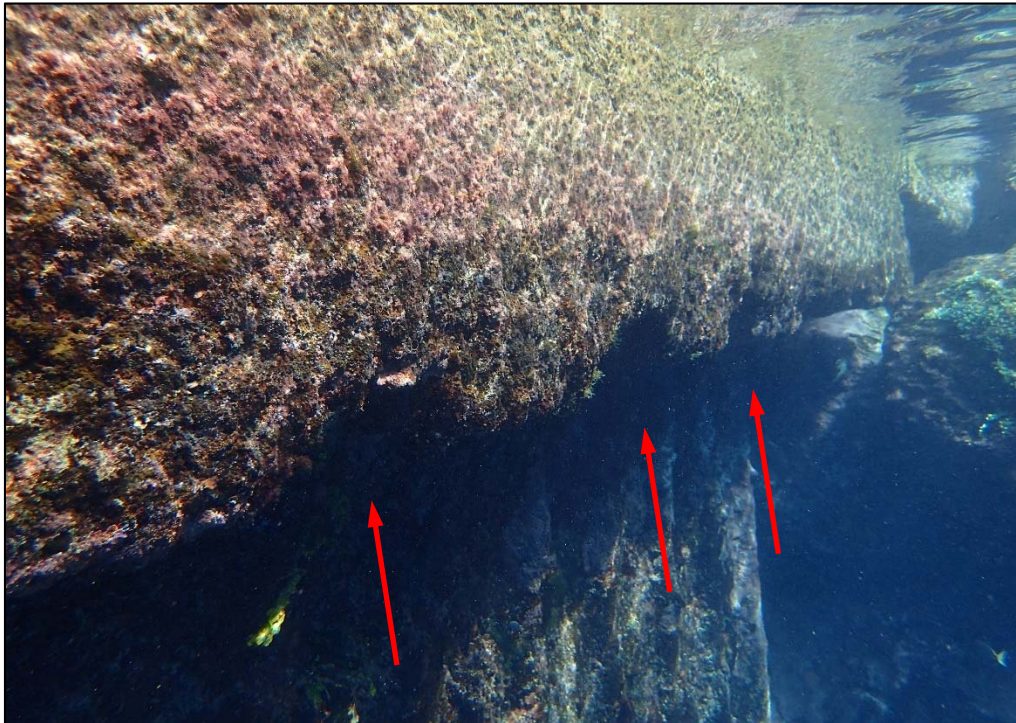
Bottom of concrete cap, south face of Berth 1. Poorly consolidated concrete at the bottom of the cap was noted throughout Berth 1. See Attachment B for further discussion of concrete deterioration.
